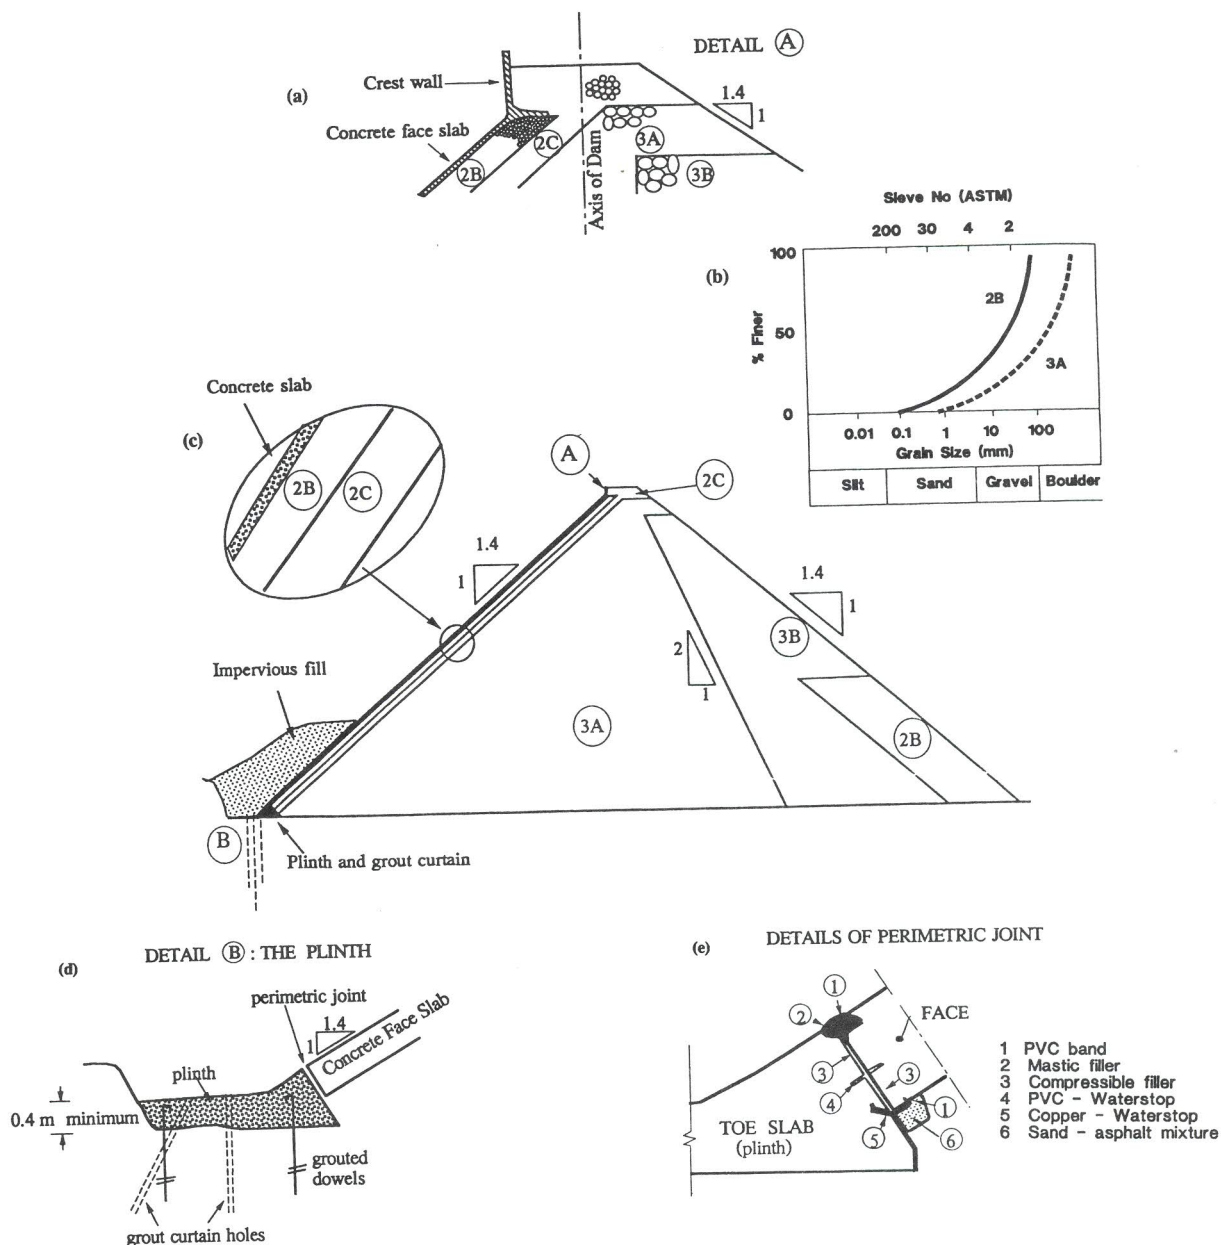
CFR Dam: (a) Detail of Crest; (b) Material Composition; (c) Typical Cross Section; (d) Cross Section and Detail of Plinth; (e) Cross Section and Detail of Parametric Joint
